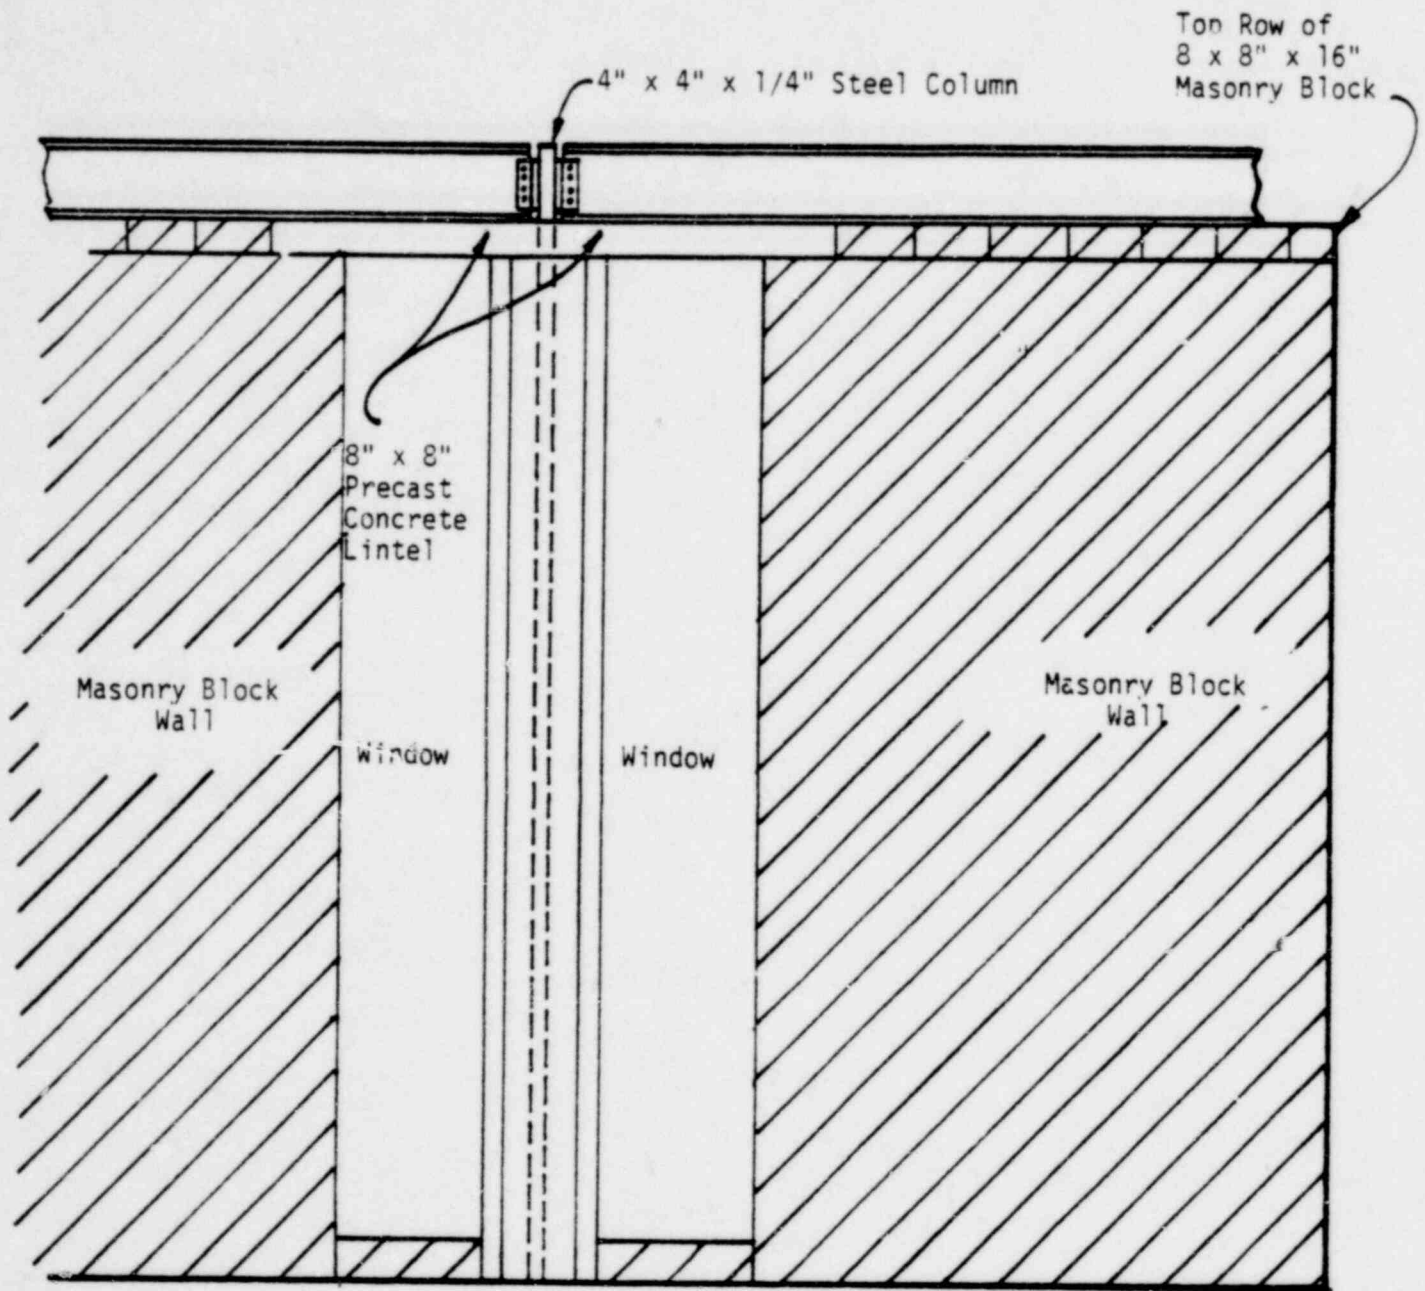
ELEVATION OF A TYPICAL EXTERIOR COLUMN, LINTEL, AND WALL PIER SYSTEM
